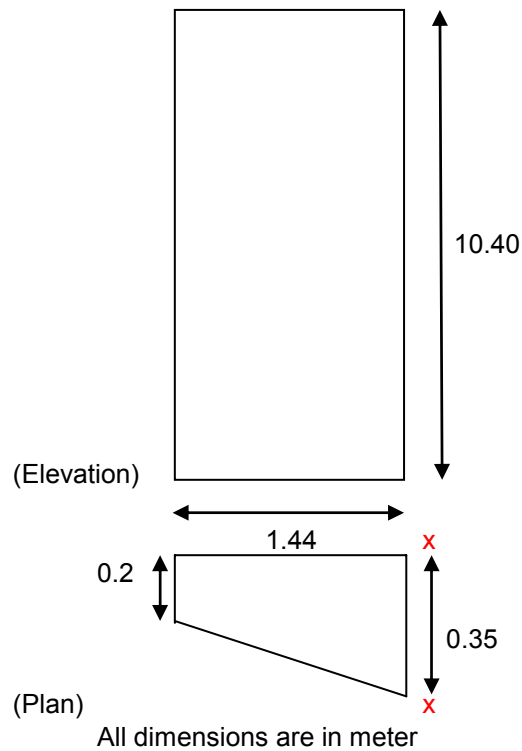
ELEVATION AND PLAN OF SIDE WALL OF ABUTMENT WALL
